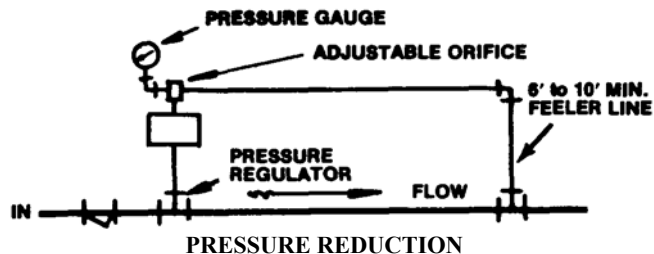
Typical installation of a pressure regulator showing: feeler pipe connection, adjustable orifice and pressure gauge. Feeler pipe is connected to reduced pressure side of supply line at a point 6 ft. to 10 ft. minimum from regulator valve.
